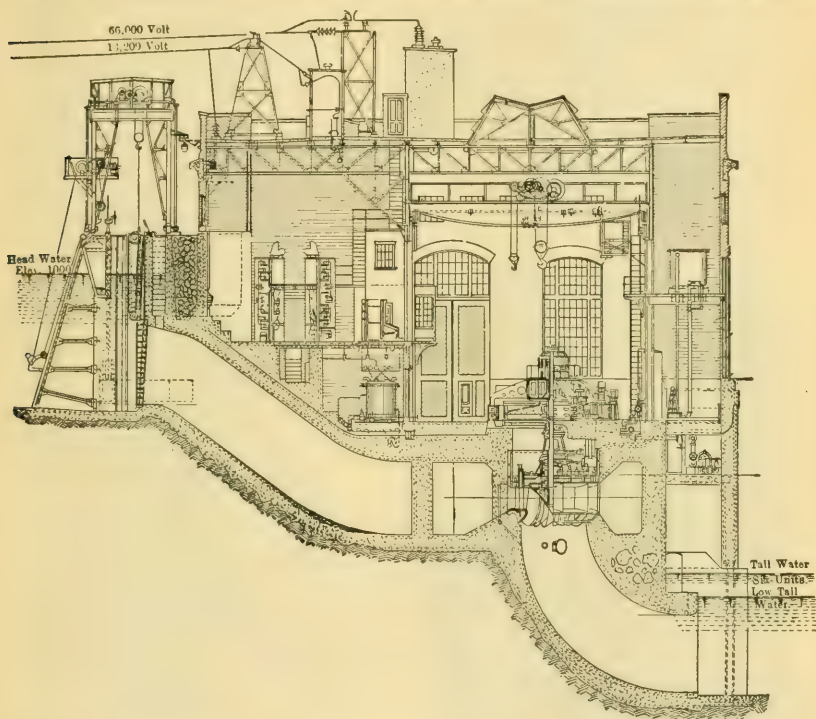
Sectional Elevation of Power House, Turners Falls Power and Electric Company, Showing Headgate Arrangement.
